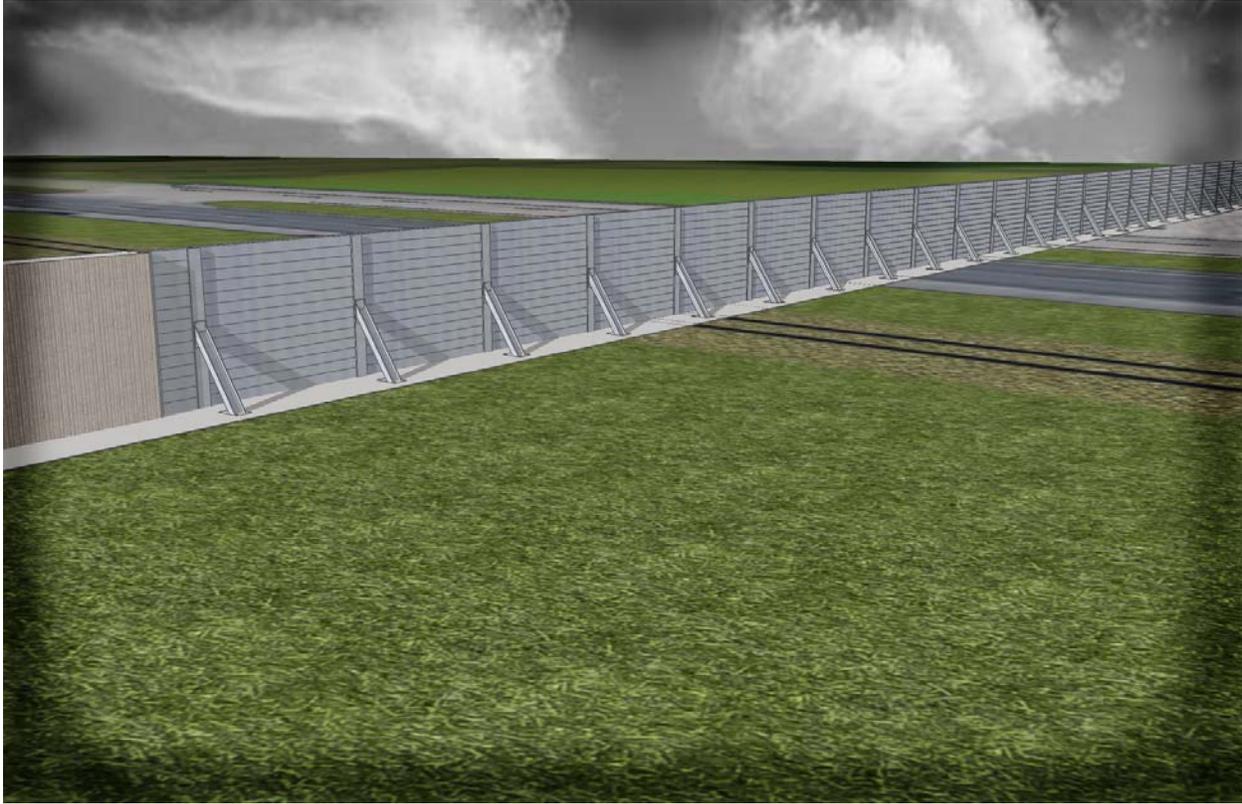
Invisible Floodwall Alternative Rendering (Southbound View)
